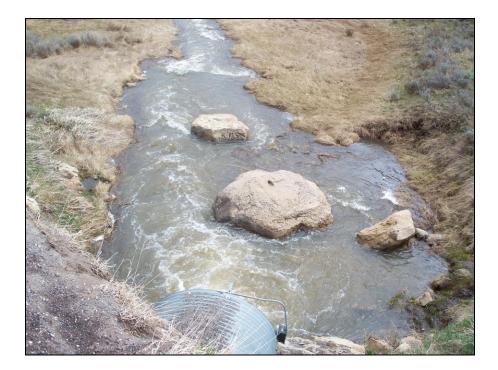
Large Boulders Downstream of a Culvert Outlet
